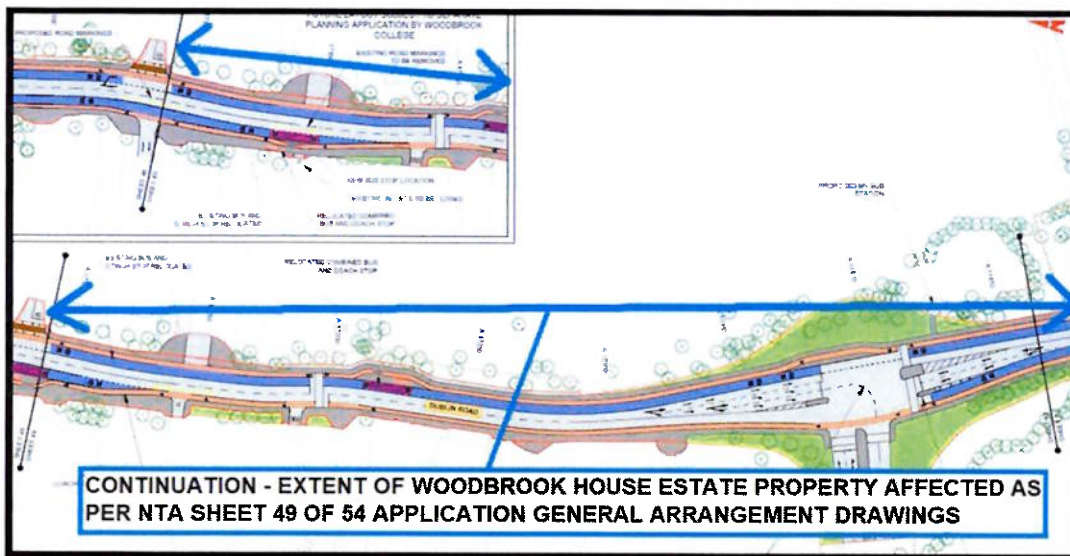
Annotated Extract NTA GA Drawing #49 of 54
